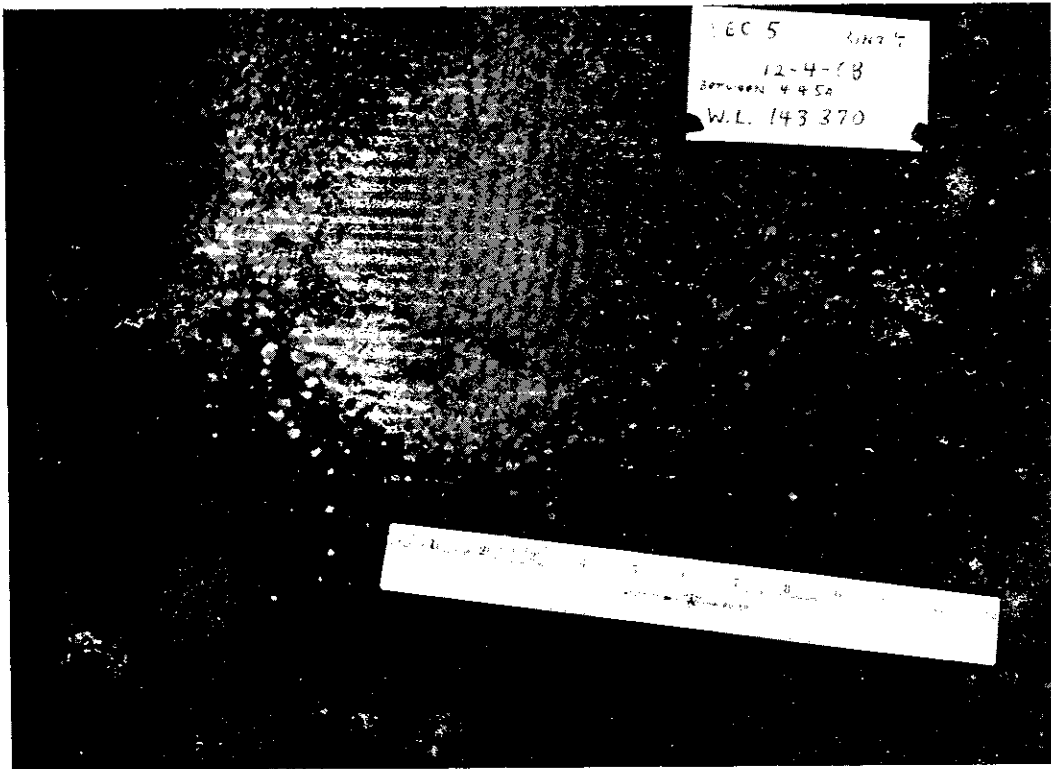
CLOSE-UP VIEW OF SECTION 5 AFTER 143,370 WHEEL LOADS TAKEN ON DECEMBER 4, 1968 JUST AFTER THE TEST TRACK WAS CLOSED FOR WINTER. NOTE THE TRANSVERSE CRACKS AND THE PUMPING OF SILT THROUGH ONE OF THE CRACKS.
